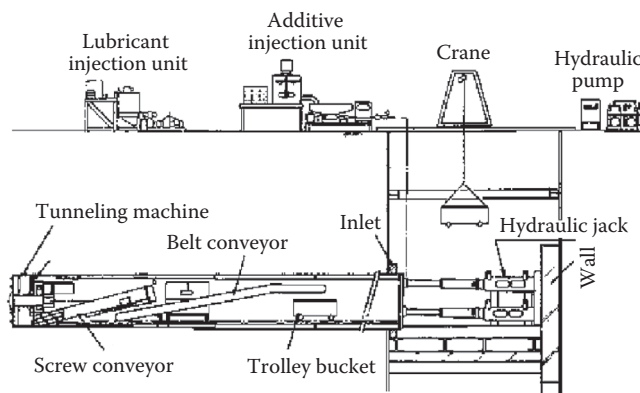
Pipe-jacking construction system with cutting blade. (From Japan Society of Trenchless Technology, Navigation system of construction method, <http://www.jstt.jp/kouhounavi/>.)
